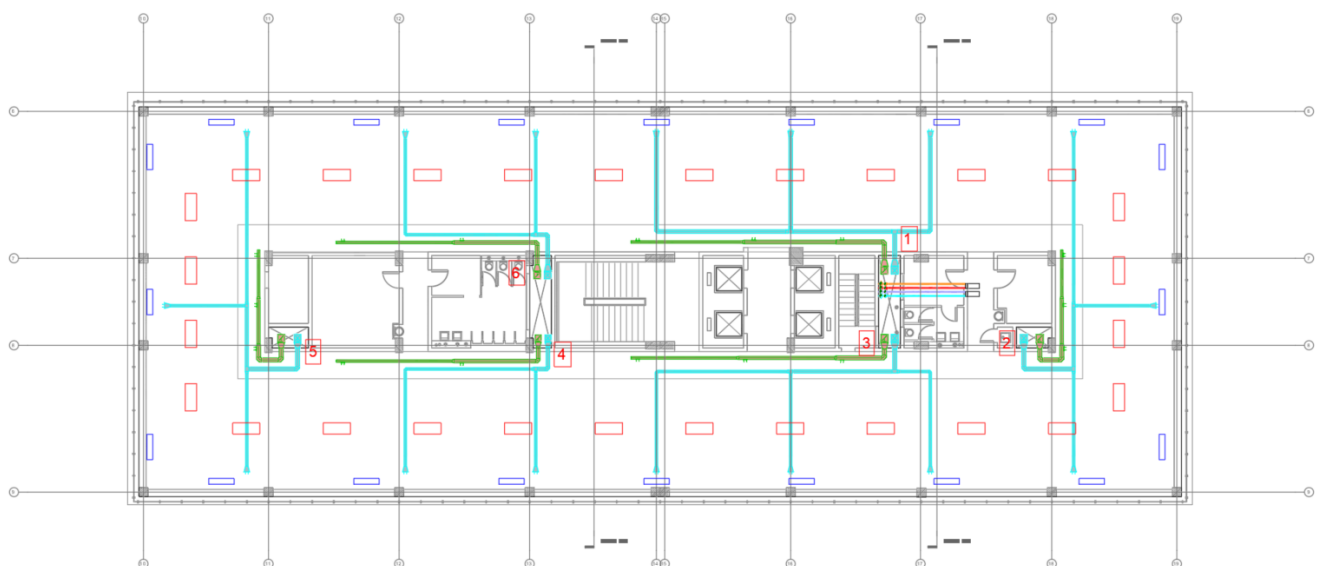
Plan view of standard plan, alternative 4 (source: AIGUASOL).
